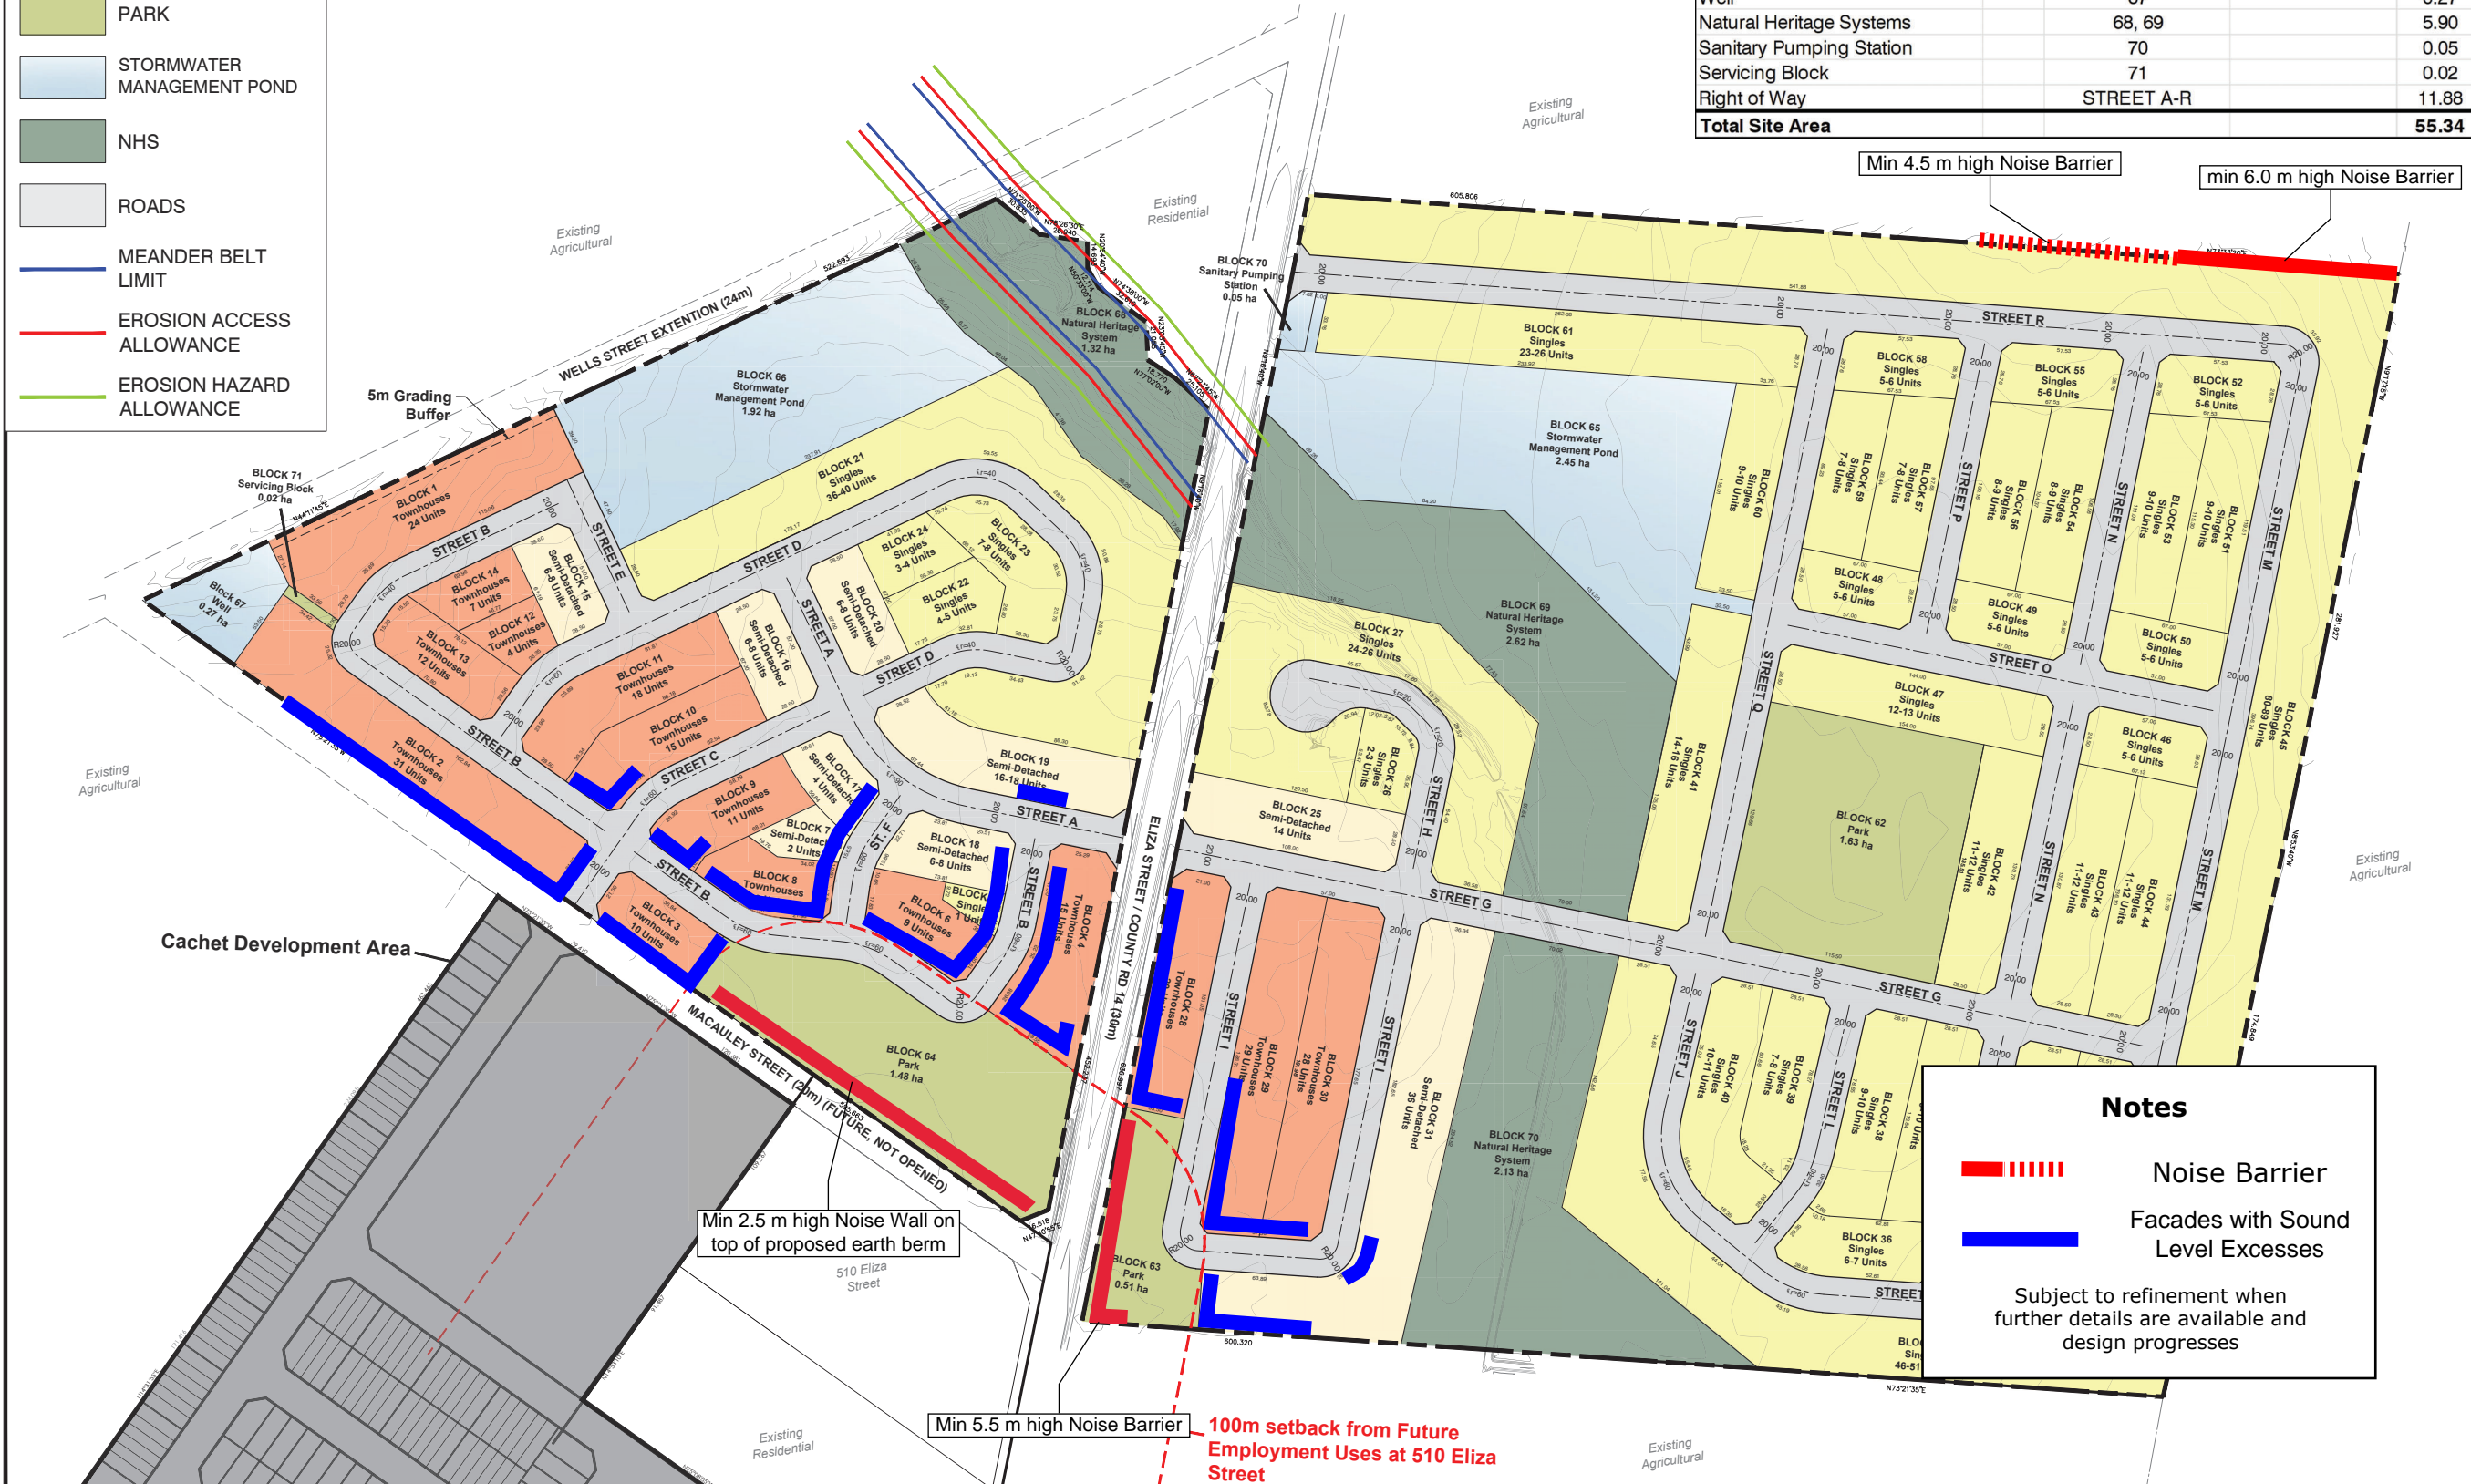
Plan Showing Noise Barrier Requirements to meet Class 4 Limits
